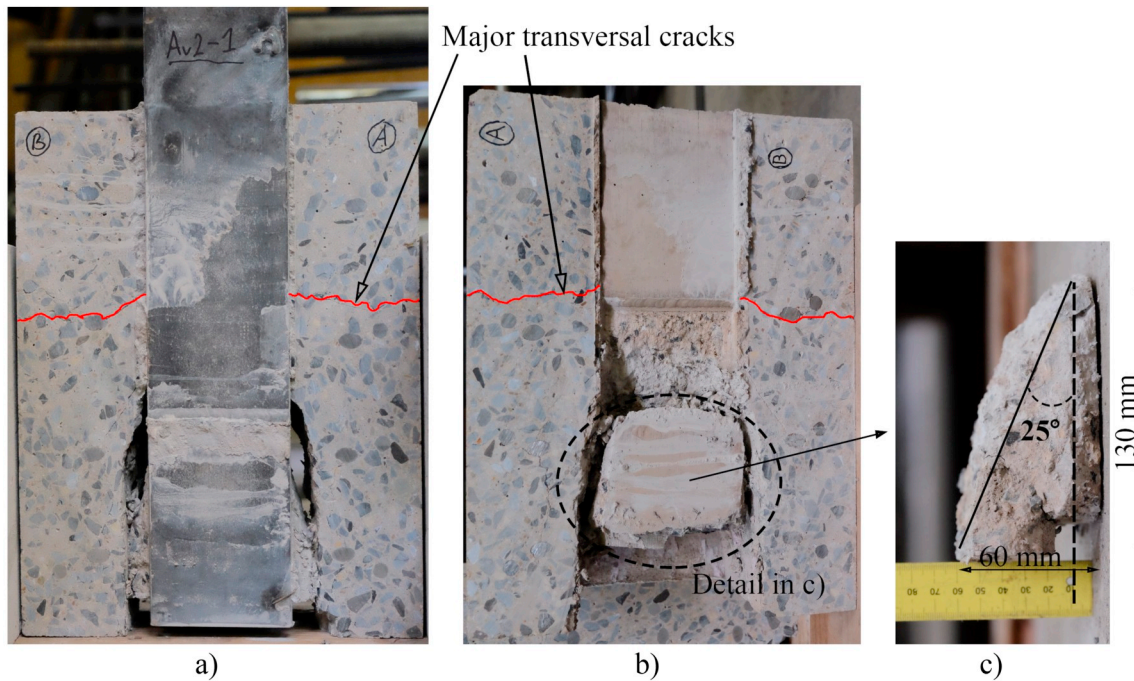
Opened specimen Av2 – a) central part with steel profile, b) concrete encasement and c) separated concrete cone.
